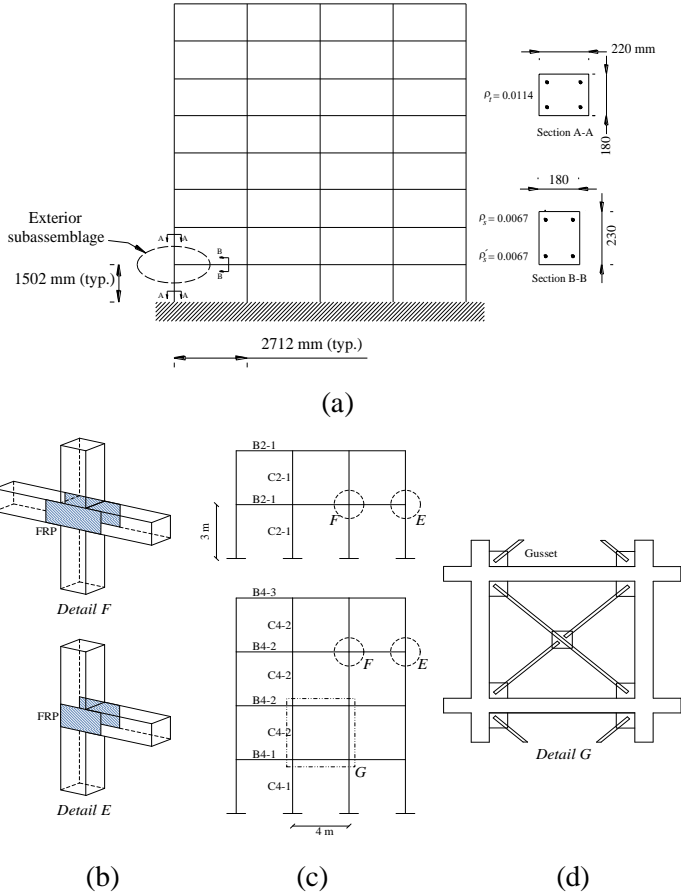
Studied frames, (a) geometry of eight-storey frames (b) FRP strengthening details, (c) geometry of two and four-storey frames, and (d) steel bracing system (Hadigeh et al., 2015).
